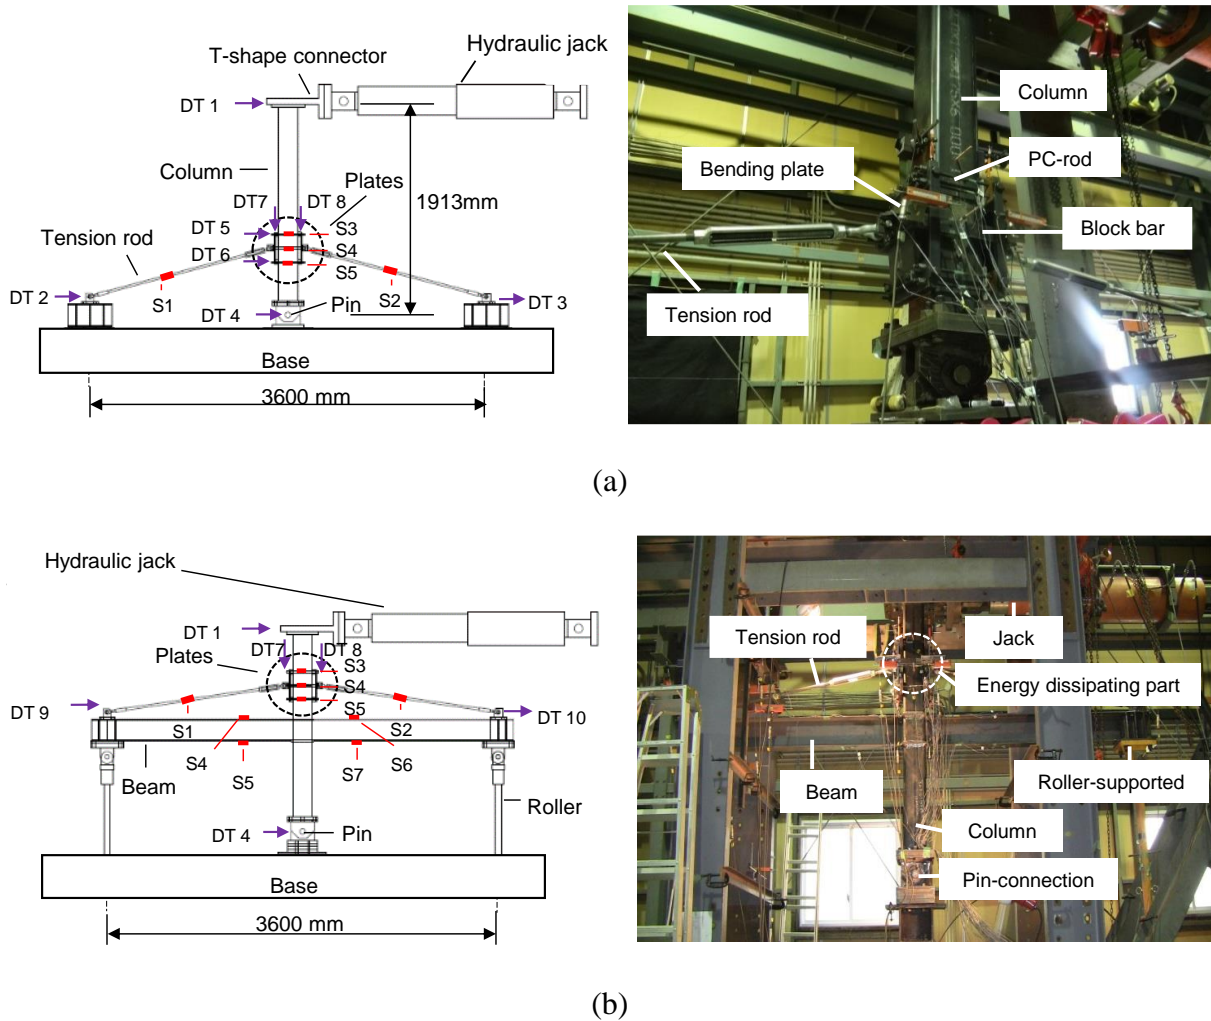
Loading system and measurement plan: (a) component test; (b) photo of component test setup; (c) application test; (d) photograph of application test setup.
